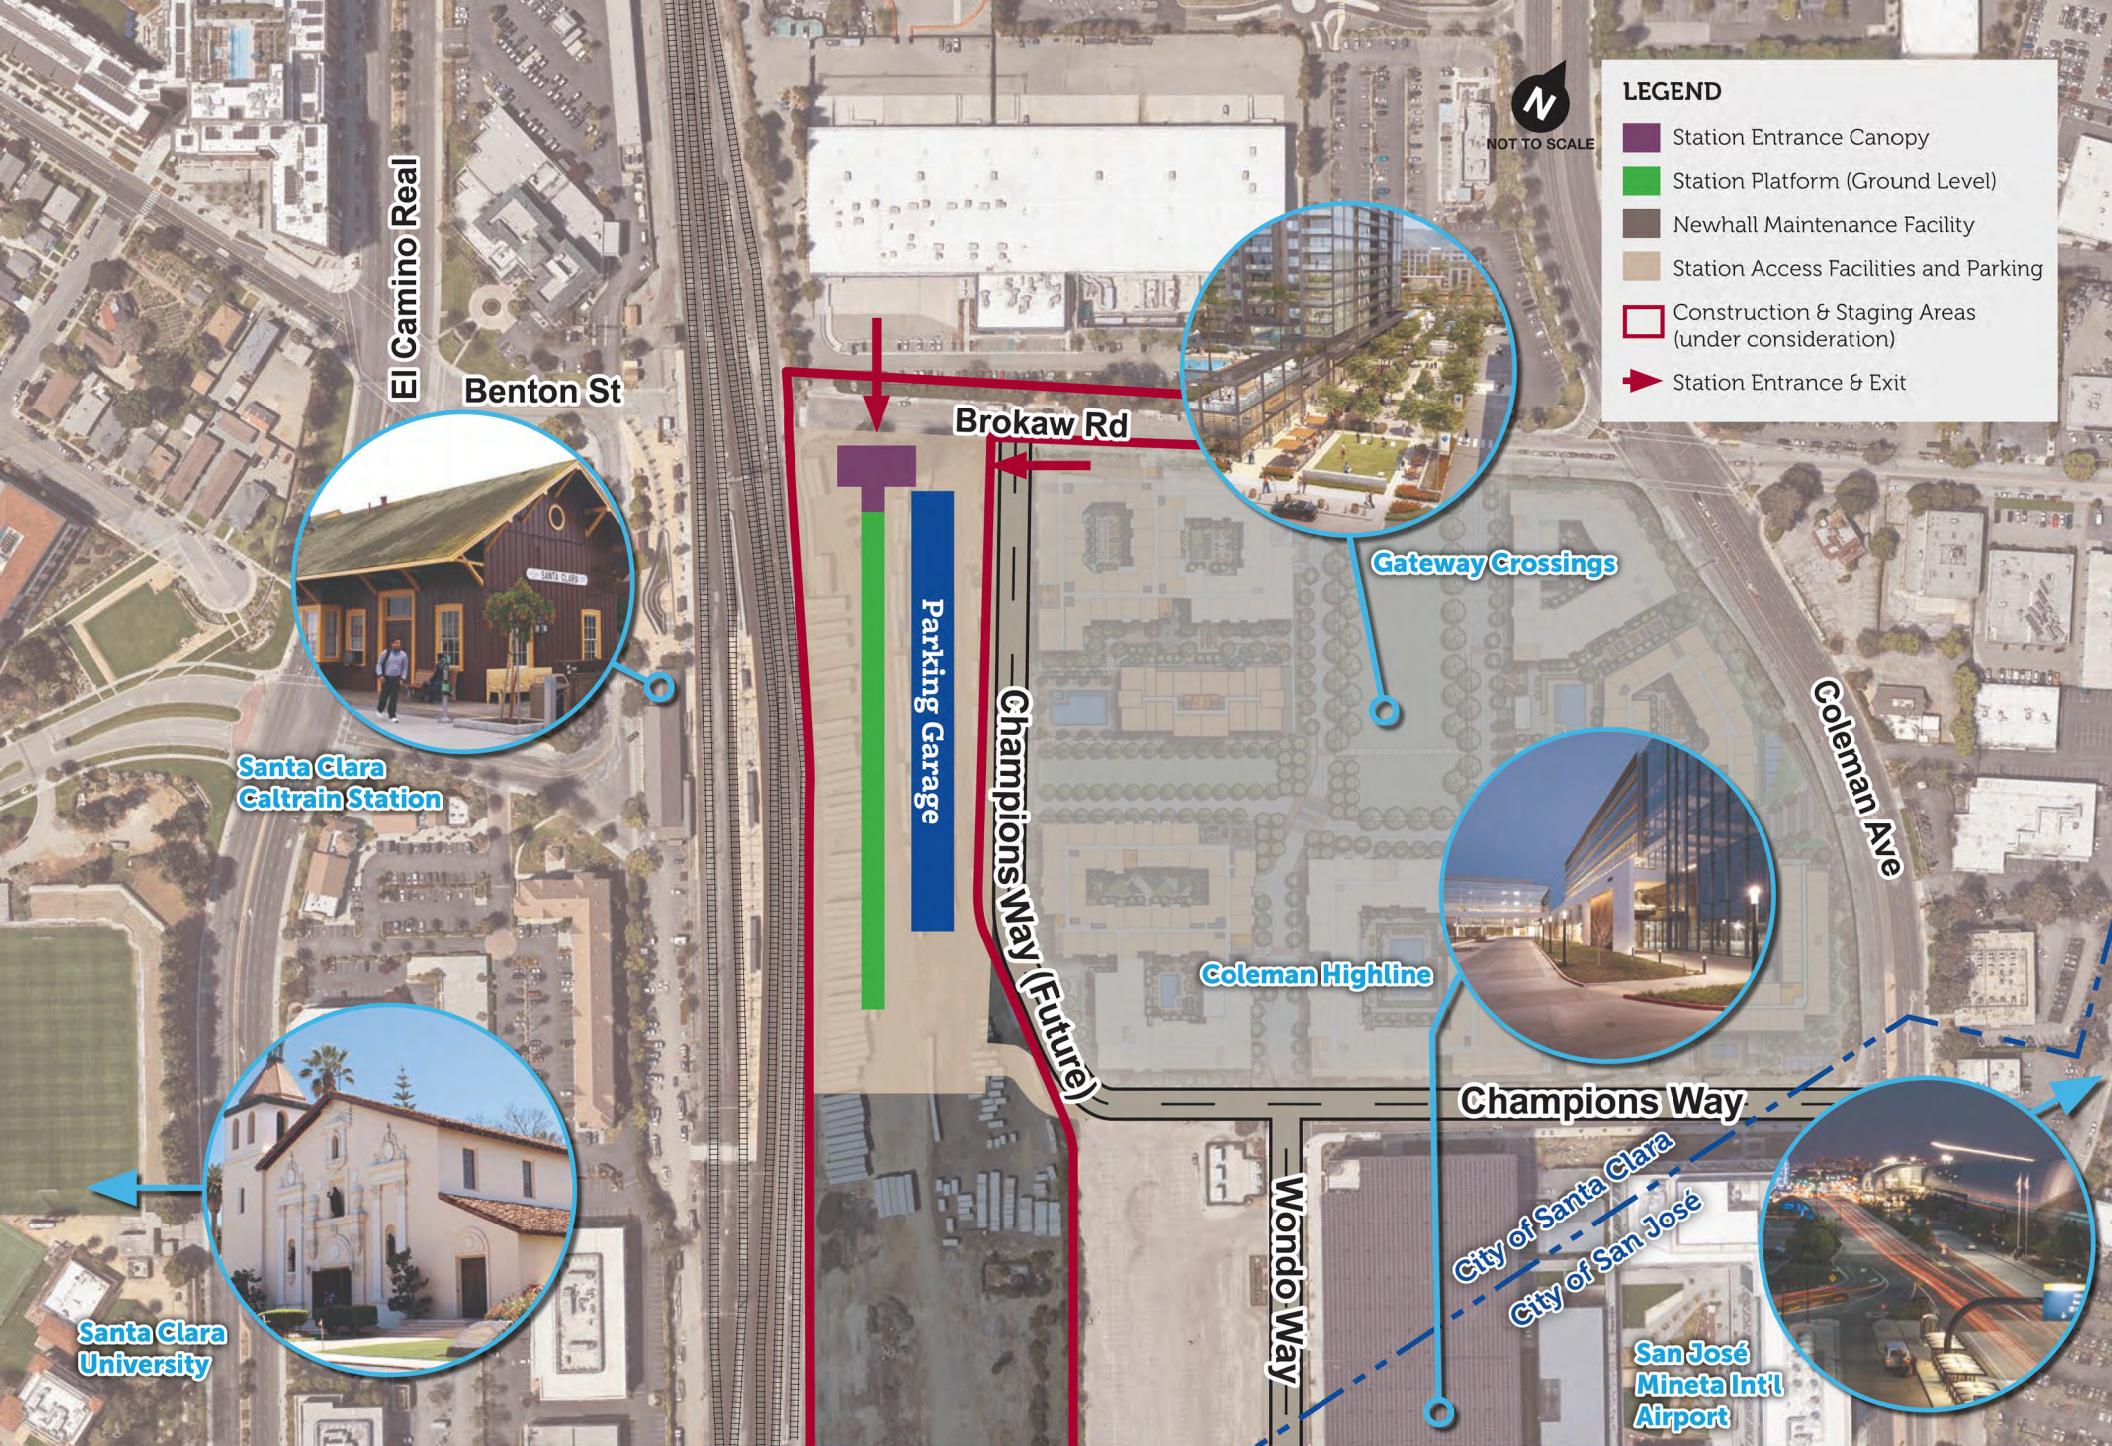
2024 Santa Clara Station Conceptual Site Plan
